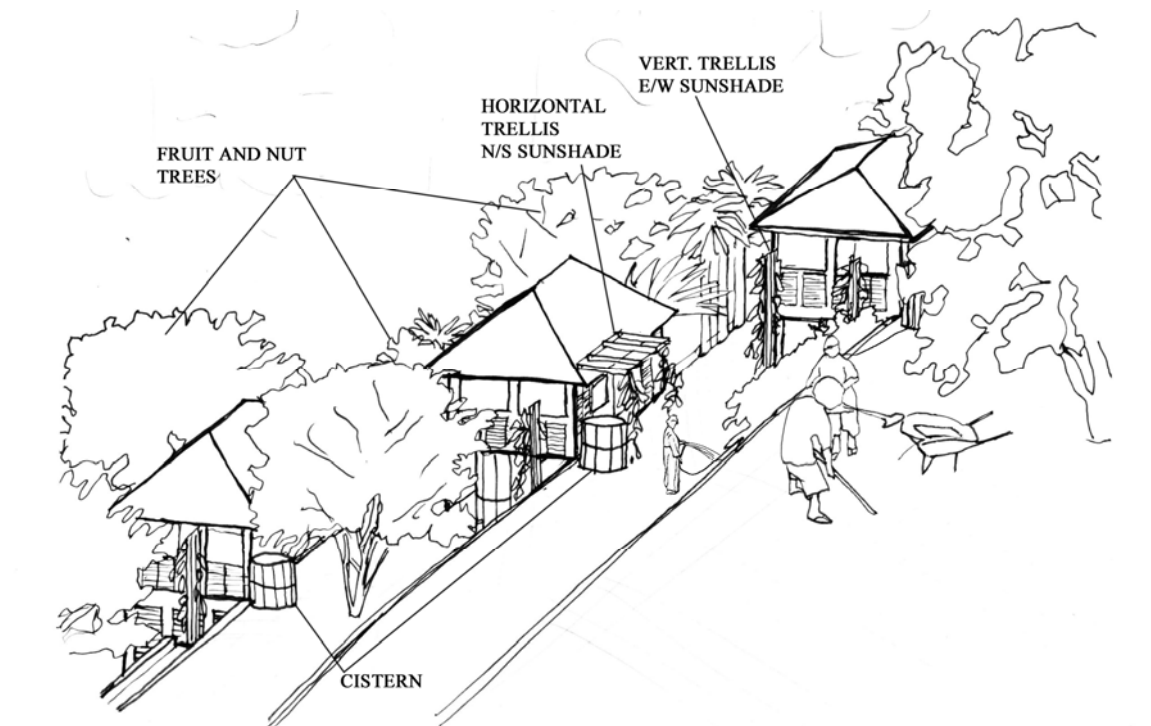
Planting vegetables and watering with harvested rainwater at the "Eyes on the Garden" units
